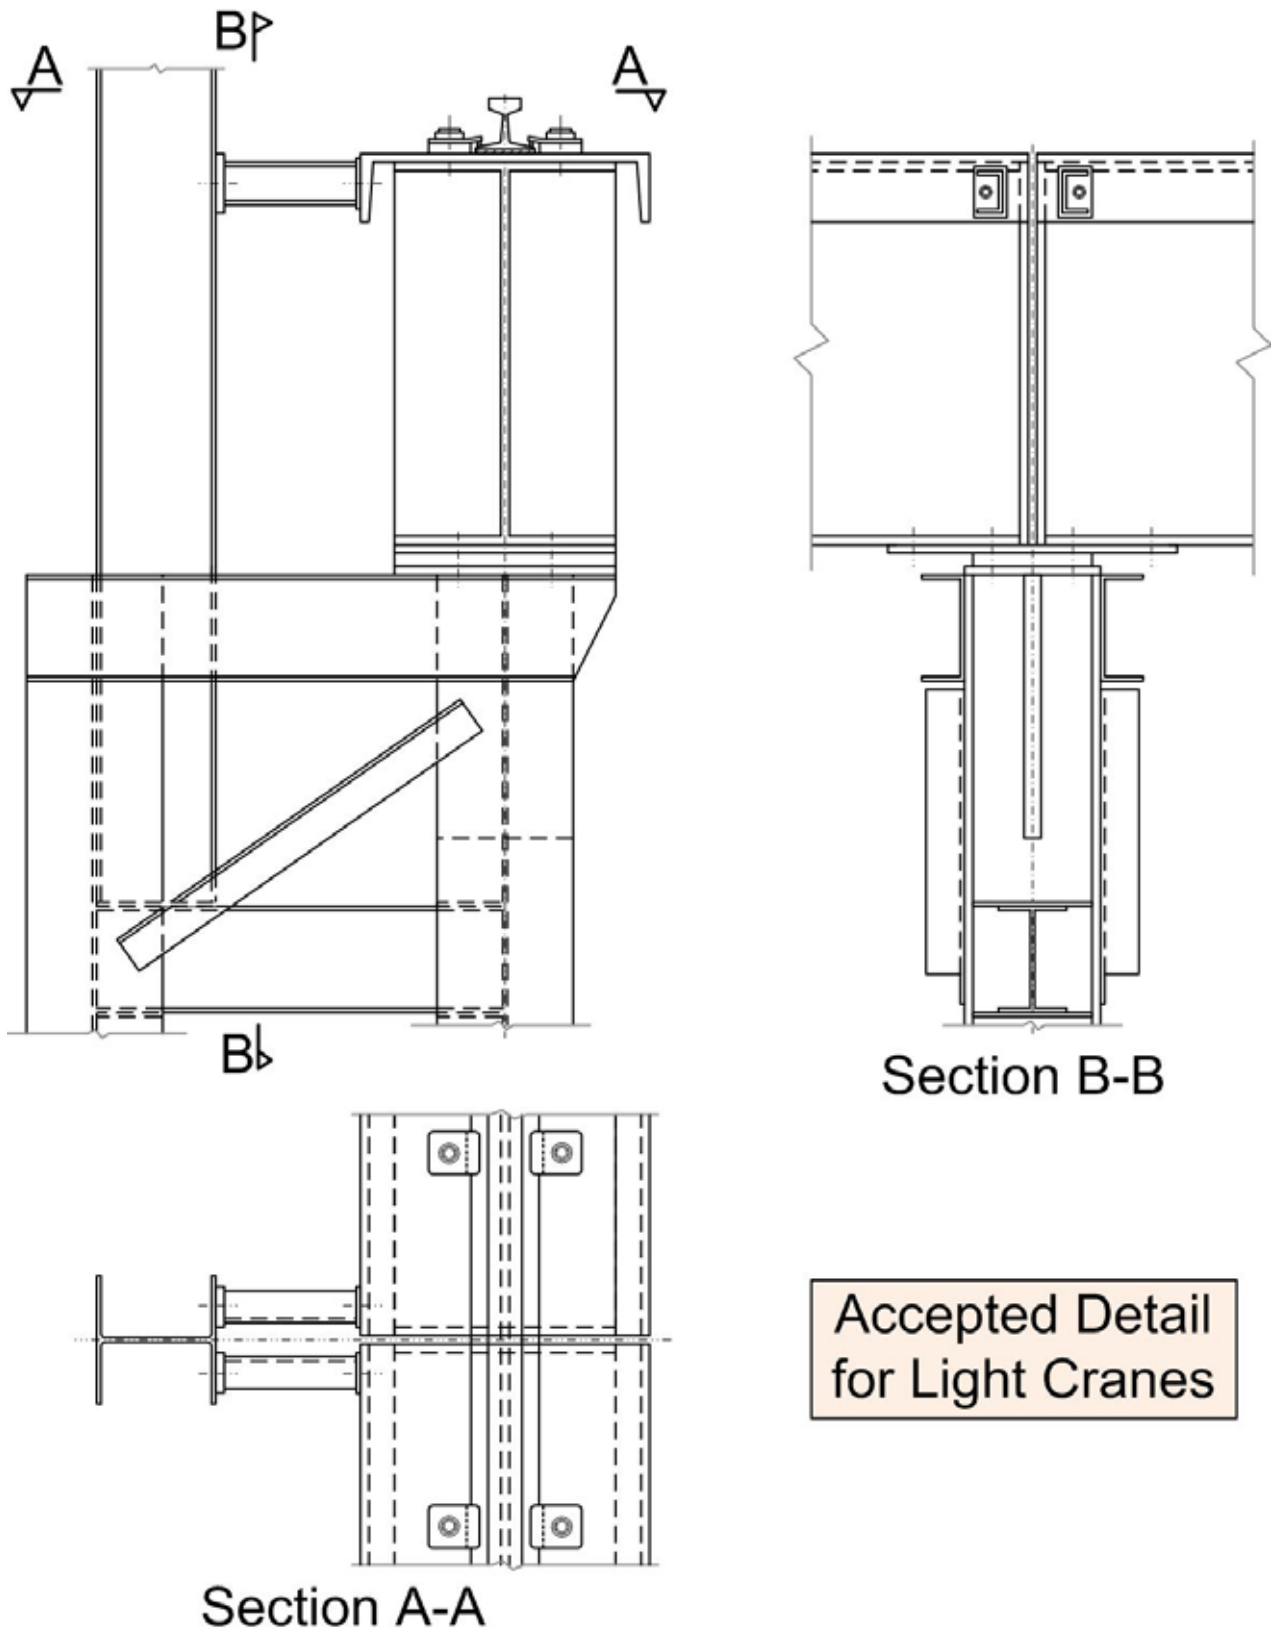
Accepted detail for light cranes situated on a latticed column. It is not recommended as the best option.
